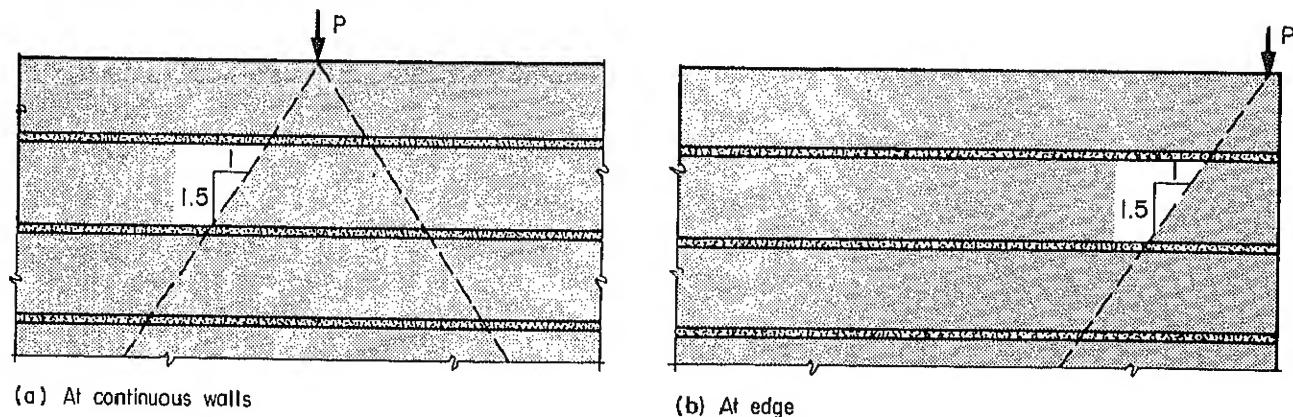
Distribution of Concentrated Vertical Forces in Wall Panels
